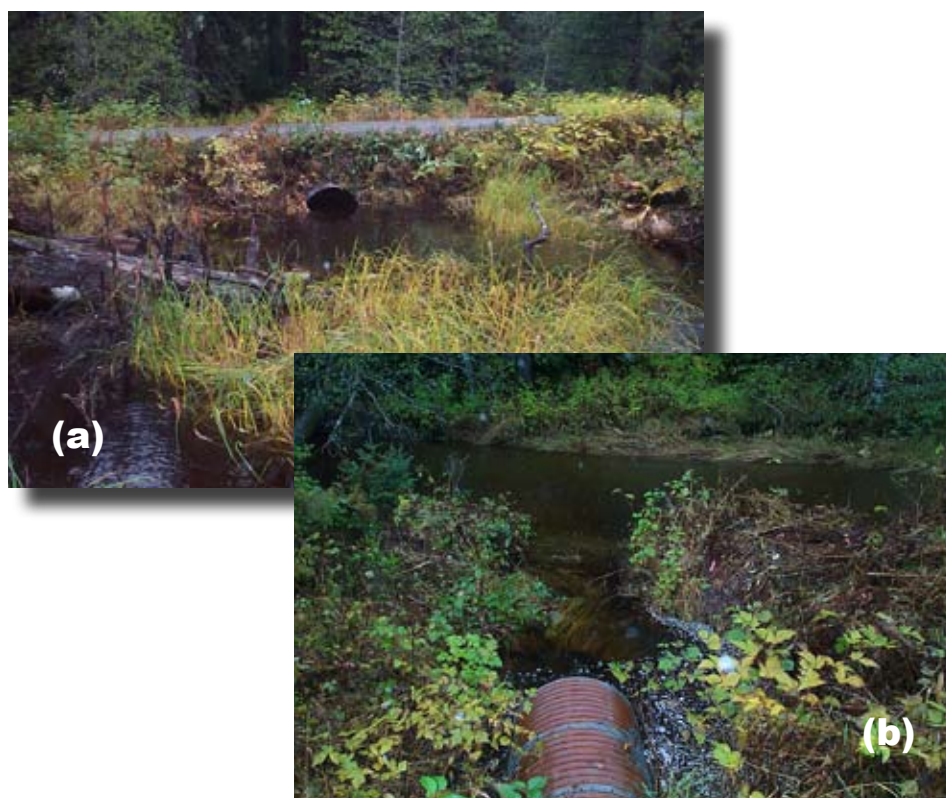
Existing culvert on Road 6235, milepost 17.59 (Tongass National Forest). (a) Culvert inlet. (b) Culvert outlet.
